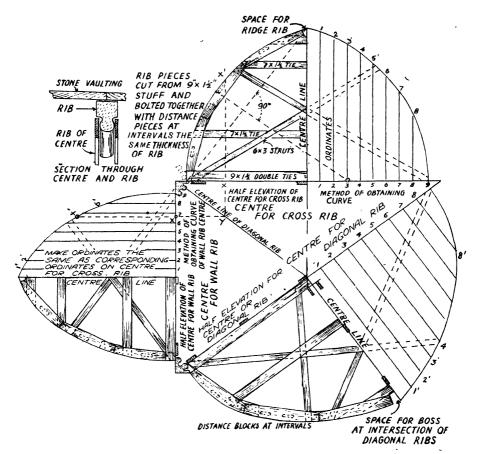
Details for cross wall and diagonal centres for vaulting
